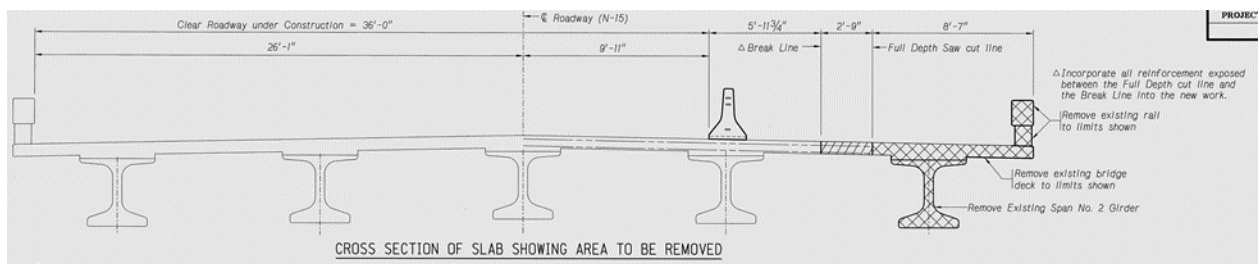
Girder replacement cross-section, from the replacement documents after the damage of Schuyler Bridge, courtesy of NDOT
